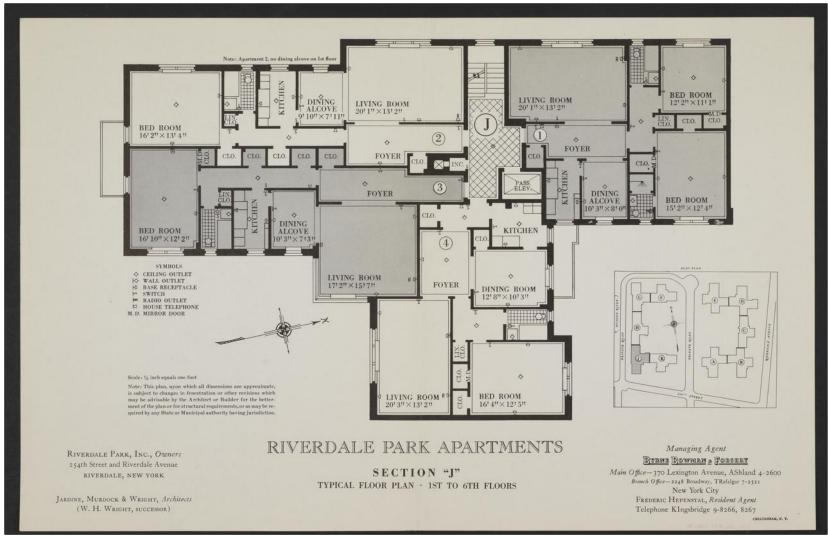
Typical floorplans in Section J of the Riverdale Park Apartments (Jardine Murdock and Wright 1939).
